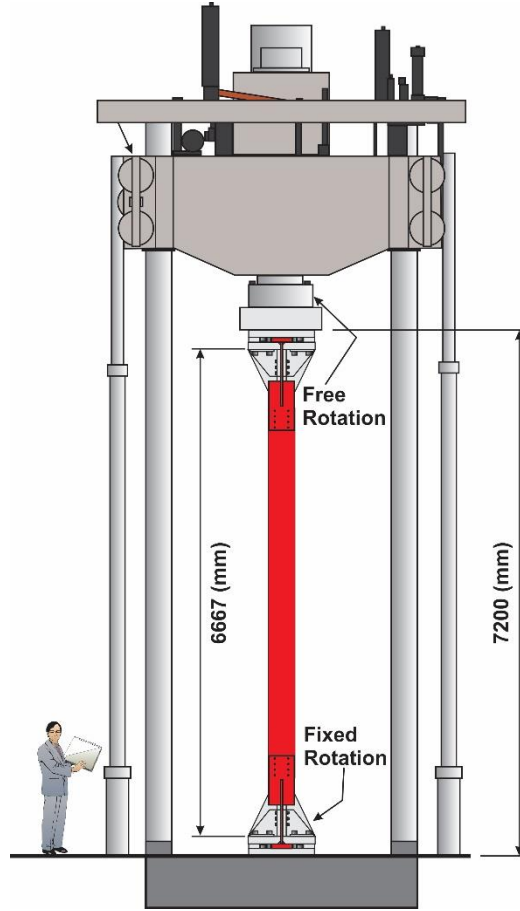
Test set-up of the full-scale I-shape brace and connection assembly [18,19]
